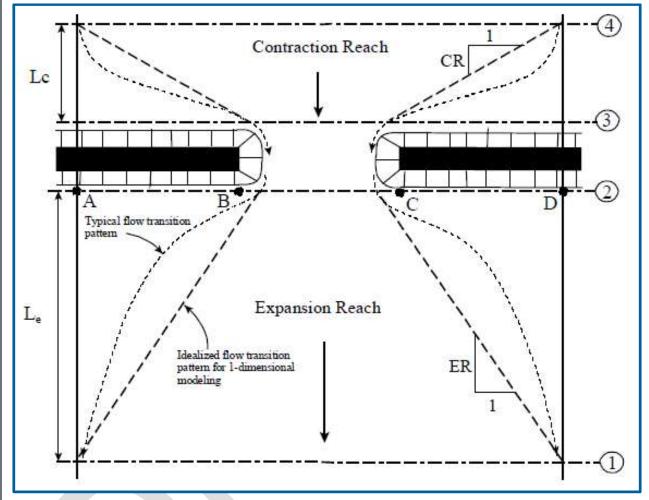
Typical Bridge Cross Section Layout for 1D Model
